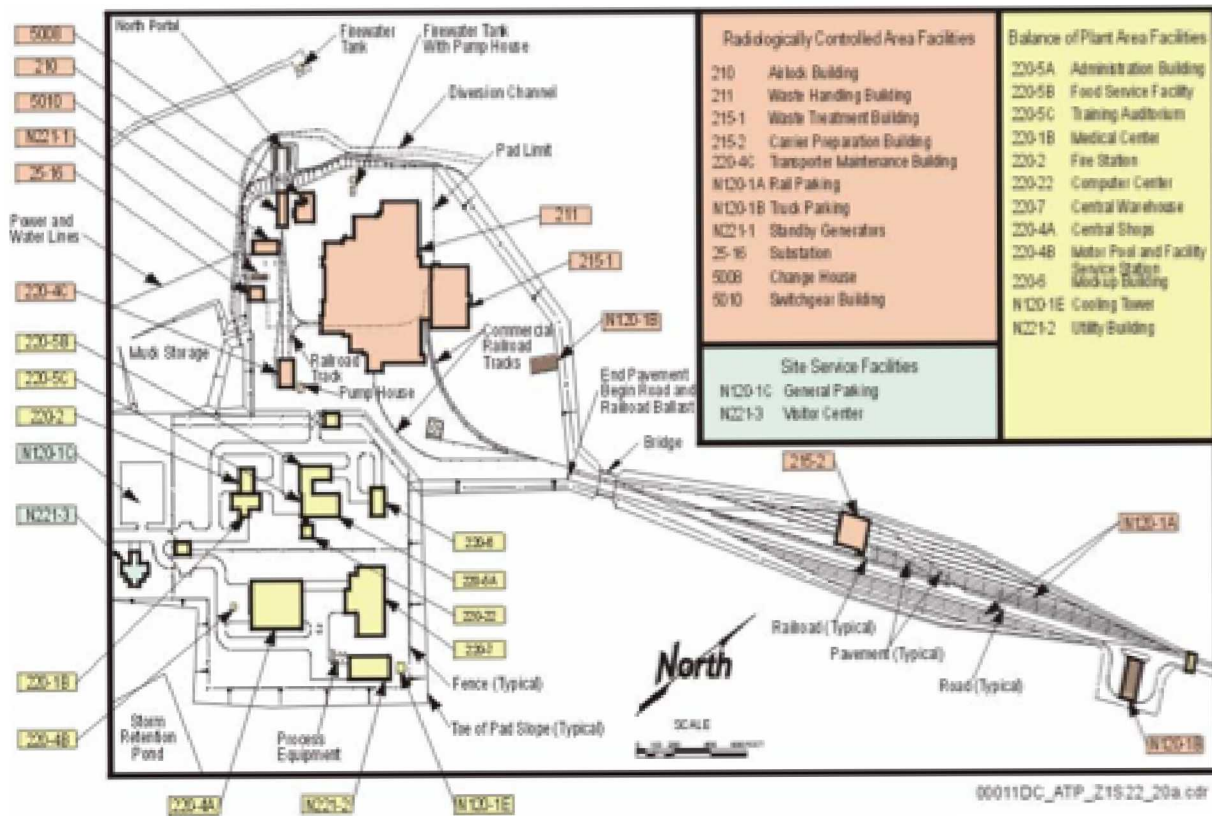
Conceptual layout of surface facilities for the Yucca Mountain GR site. Source [19].
